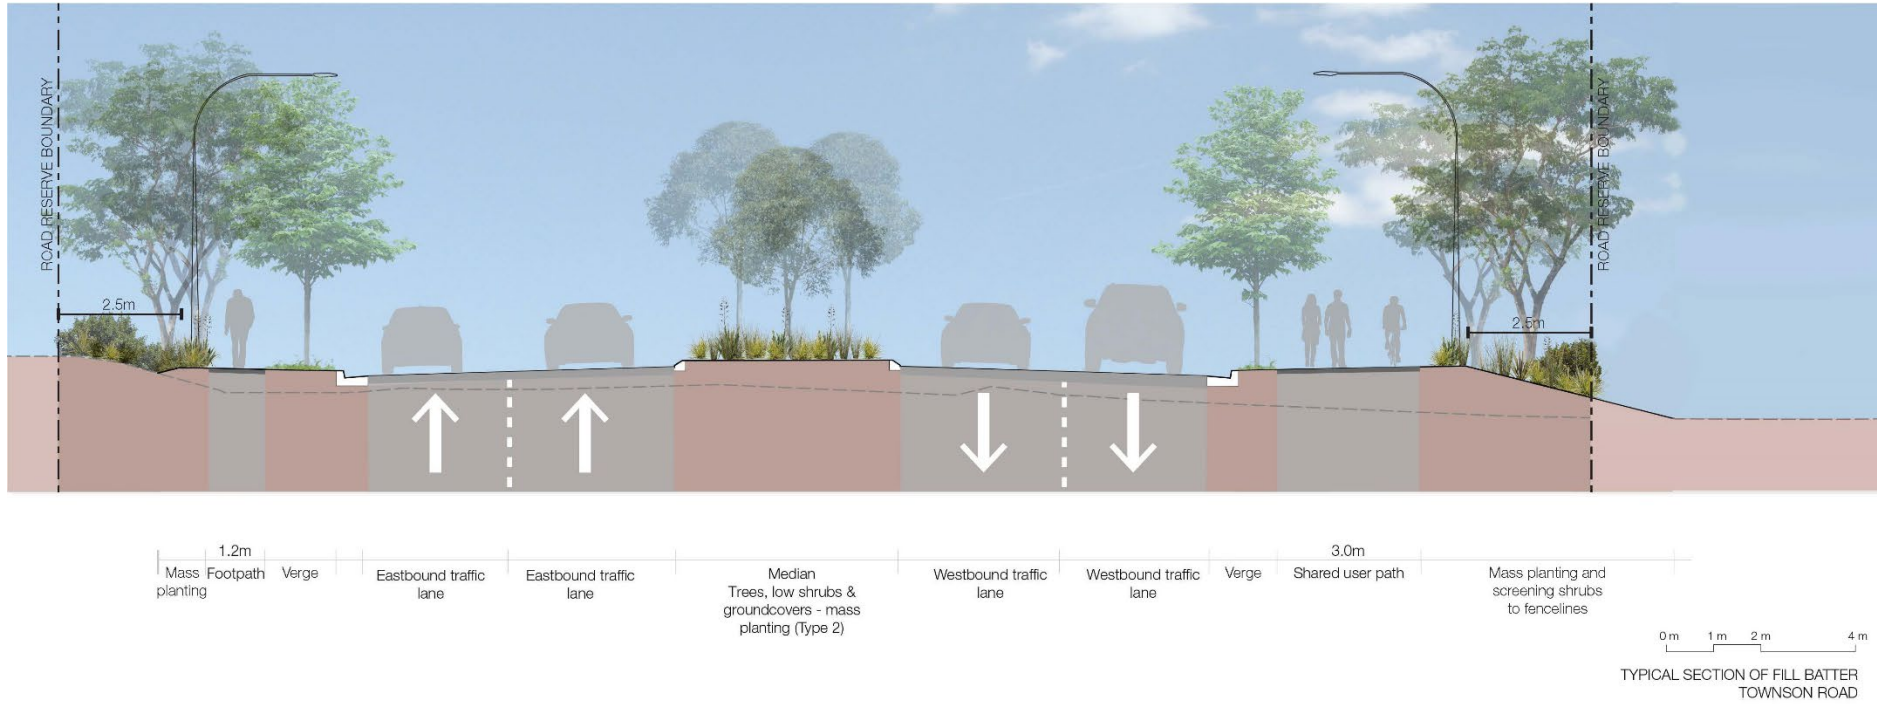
Typical section through Townson Road ultimate phase fill batters
